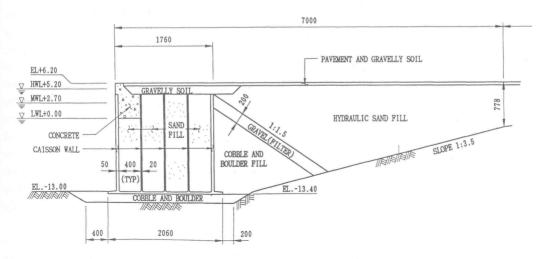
Typical cross section of Pier #1 to #3 of Taichung Harbour [1]
